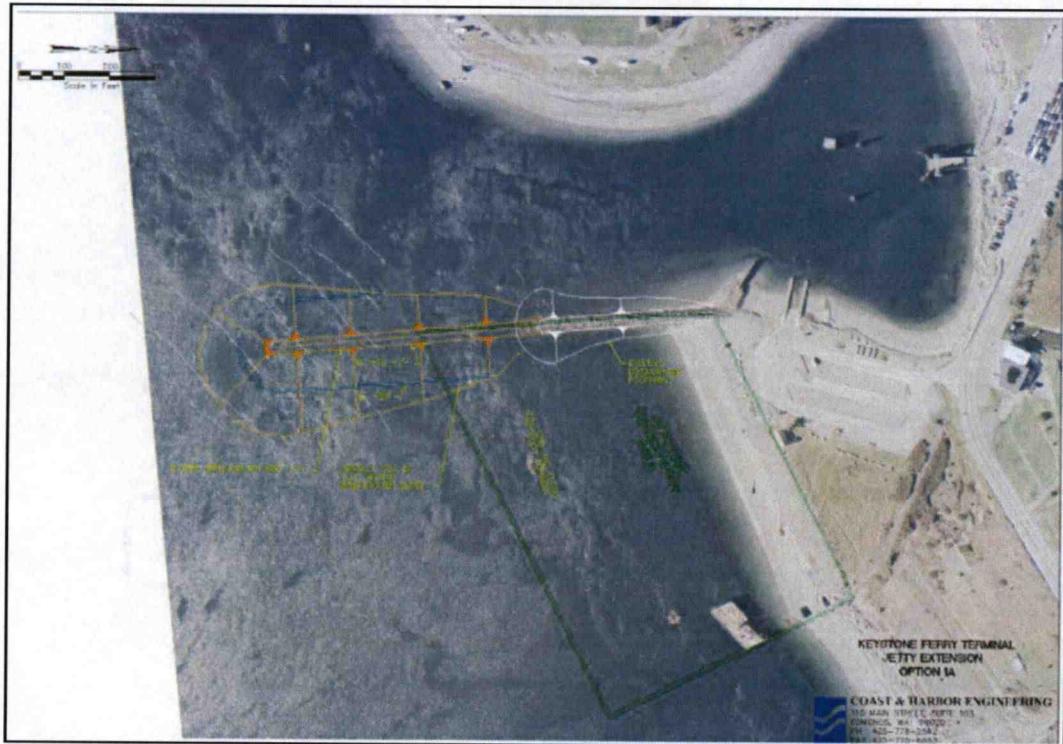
Proposed jetty design Alternative 1A. Courtesy of CHE.
